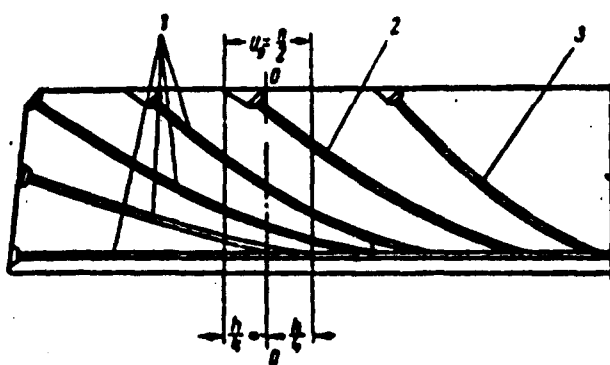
Diagram of the distribution of the bundles of reinforcement taken into account in rating a flexural prestressed reinforced-concrete element for crack formation in the cross section. 1 - bundles of reinforcement taken into account in rating cross section 0-0 using formulas (164)-(166); 2 - bundle of reinforcement, taken into account in rating cross section 0-0 using formula (162); 3 - bundle of reinforcement, not taken into account in rating cross section 0-0.
